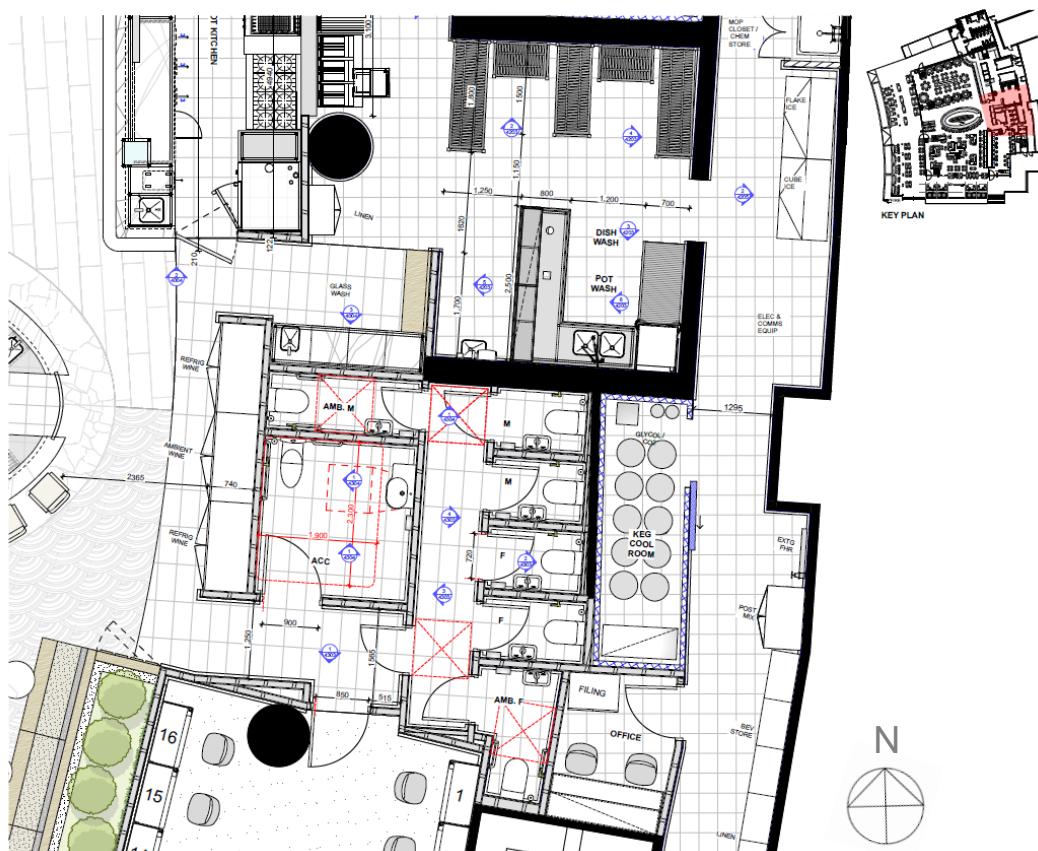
Proposed Kitchen/ Bathrooms Arrangement Plan
